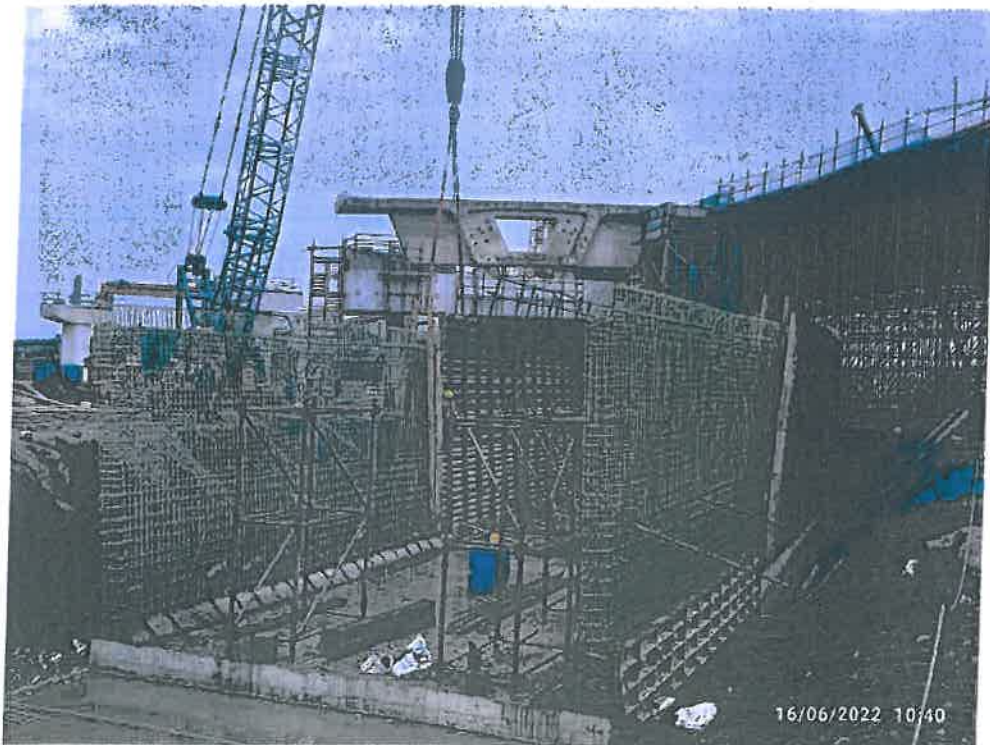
Retaining wall formwork fixing at Ramp CA in progress
